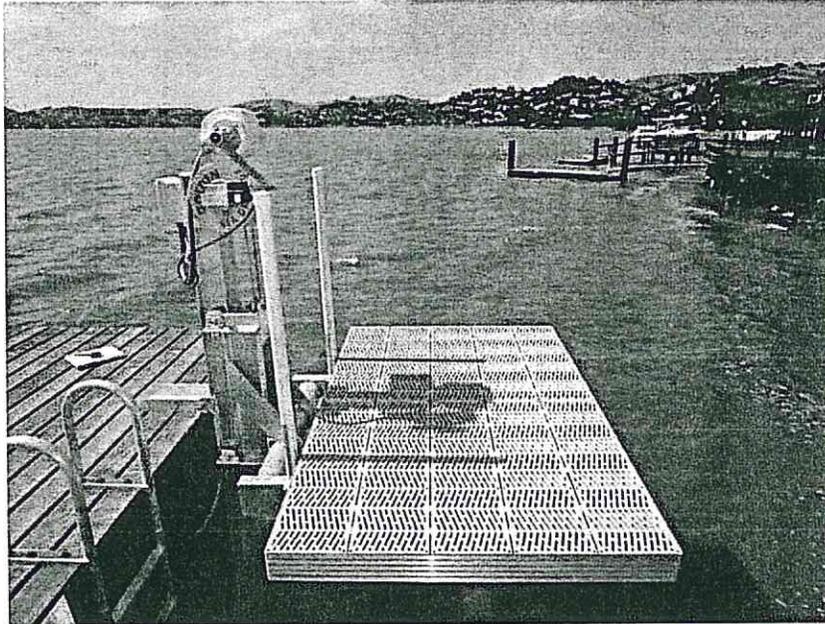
Platform lift installed along West Shore Rd, Belvedere
